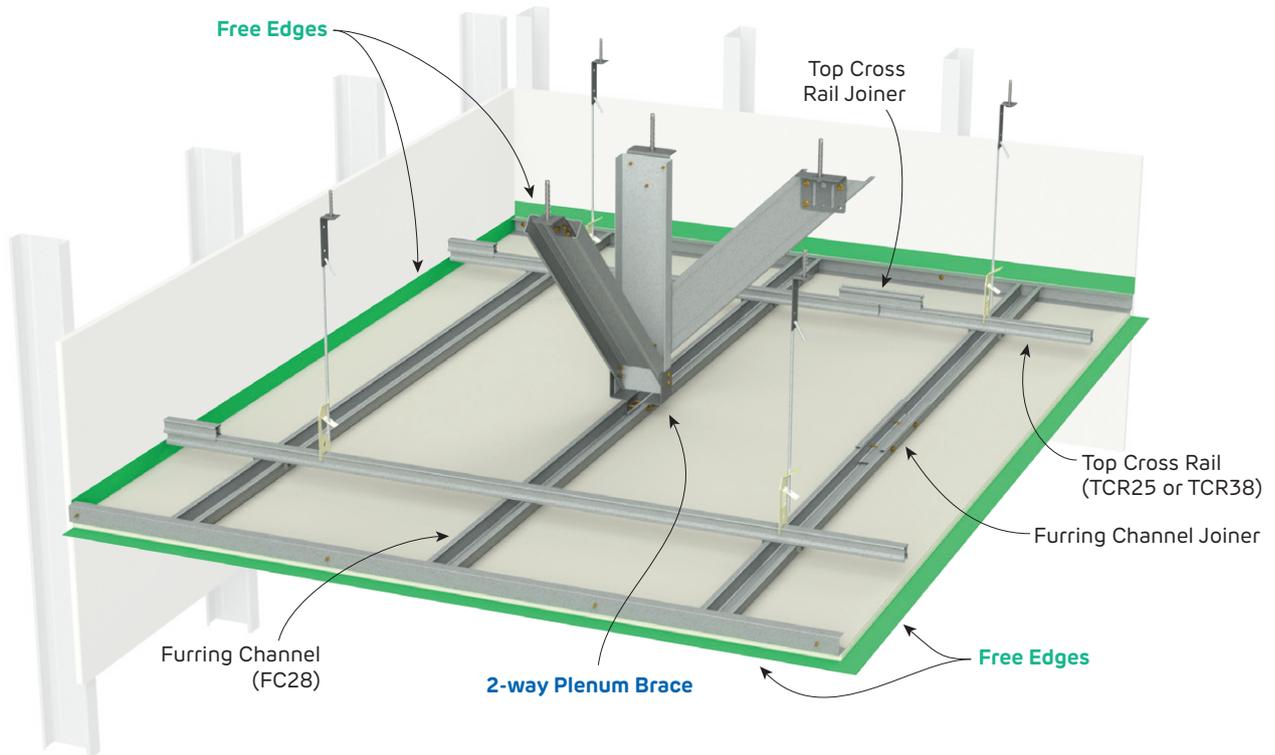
Suspended Ceiling - Type C, 2-way Plenum Braced
